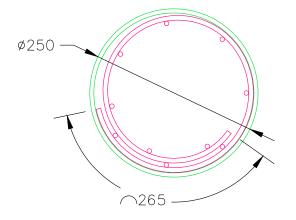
Sectional view of a reinforced concrete beam: PVC tubes are in green, reinforcing mesh is in rose, the void is filled by concrete. Overlapping exceeds 250 mm.
